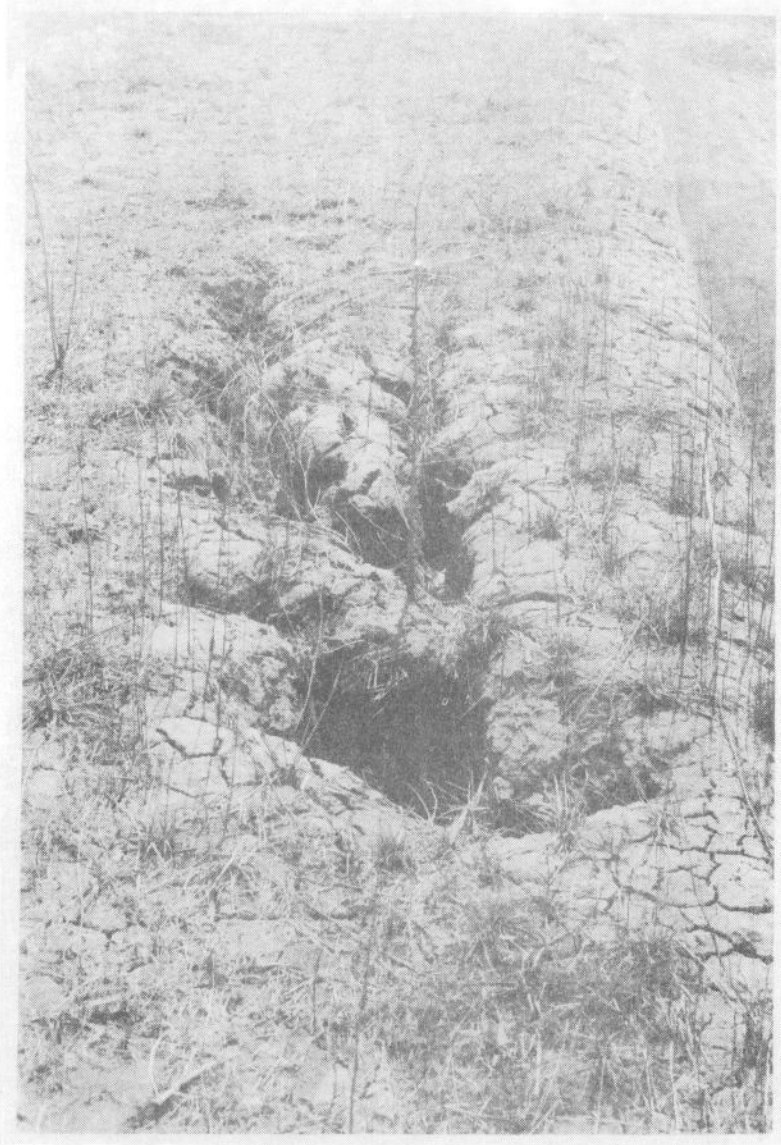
Piping inlets on a bench originating from frost damage (Holt County, Route I-29)
